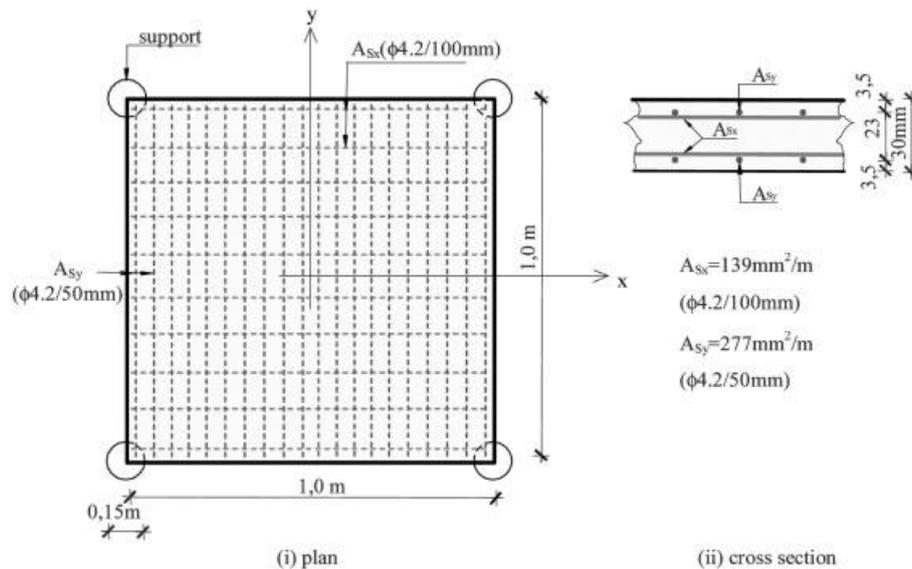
Reinforcement plan of slab MD (Radnić and Matešan, 2008).
